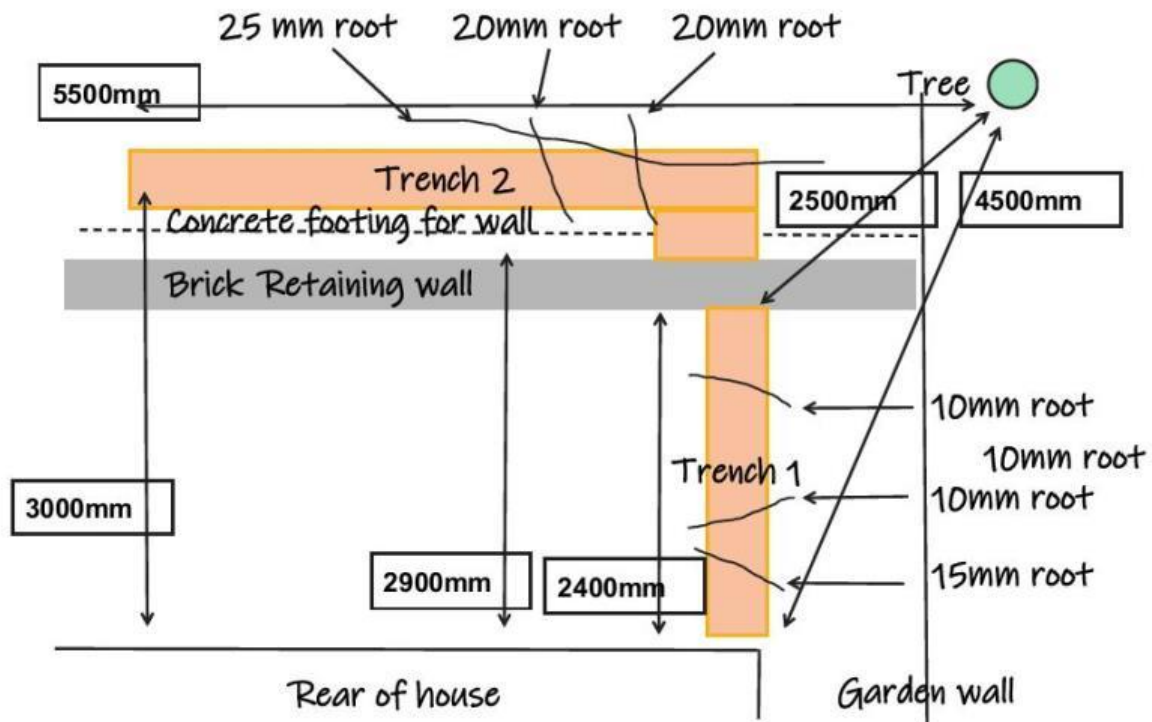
The sketch provided by the contractor showing the position of the trenches and where roots were located.
